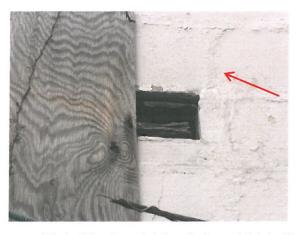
Completely rotted wood lintel with evidence of patched wall fail (red arrow)
